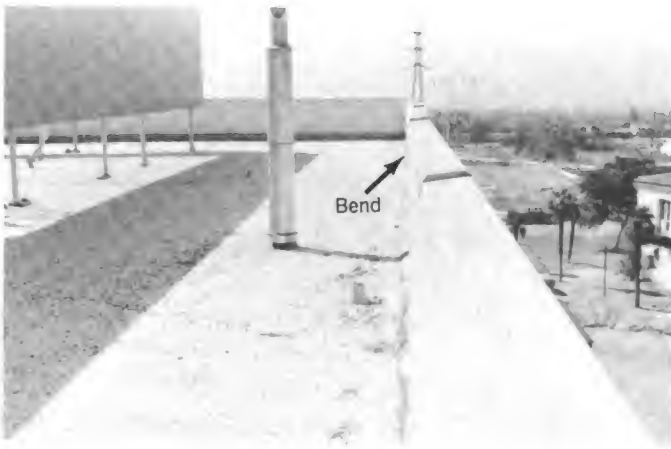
Olive View Hospital, heating and refrigeration plant. Distortion of west parapet.
